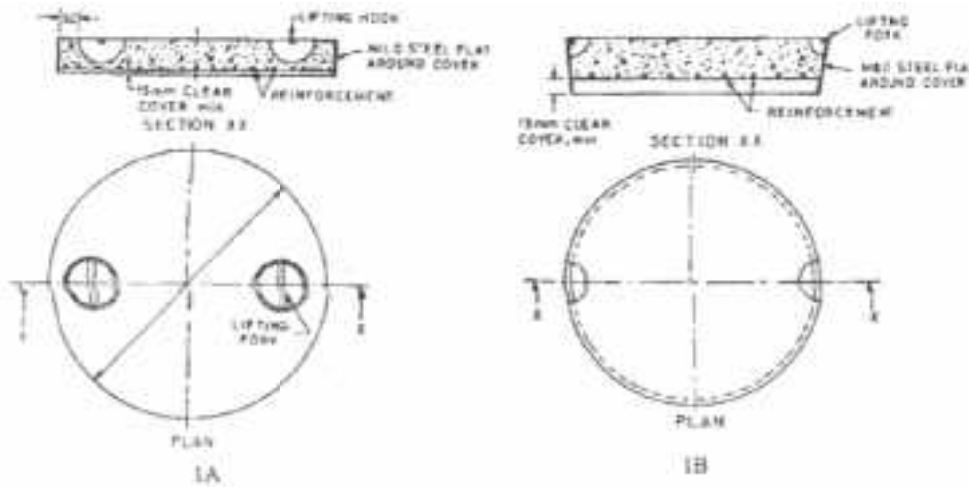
Typical Illustration of Circular Precast Concrete Manhole Cover
